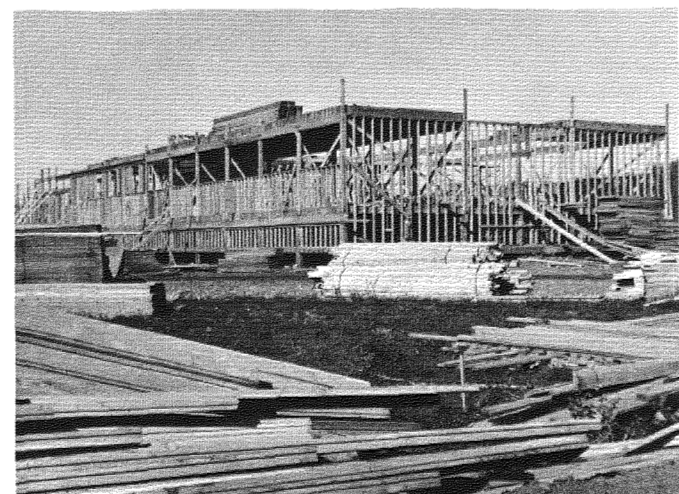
Pile foundations for hostel. Note airspace, false floor, and crawl space
